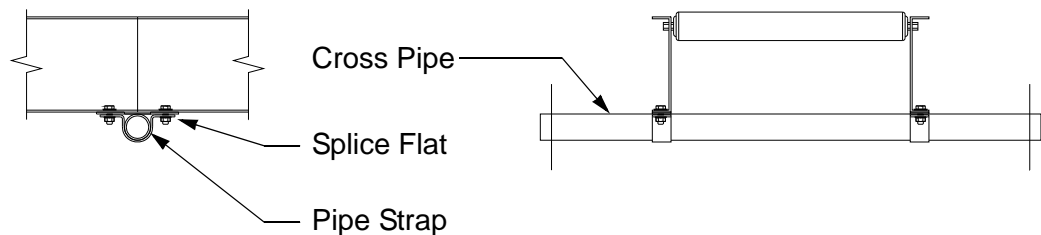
CH2-A & CH2-B Ceiling Hangers
